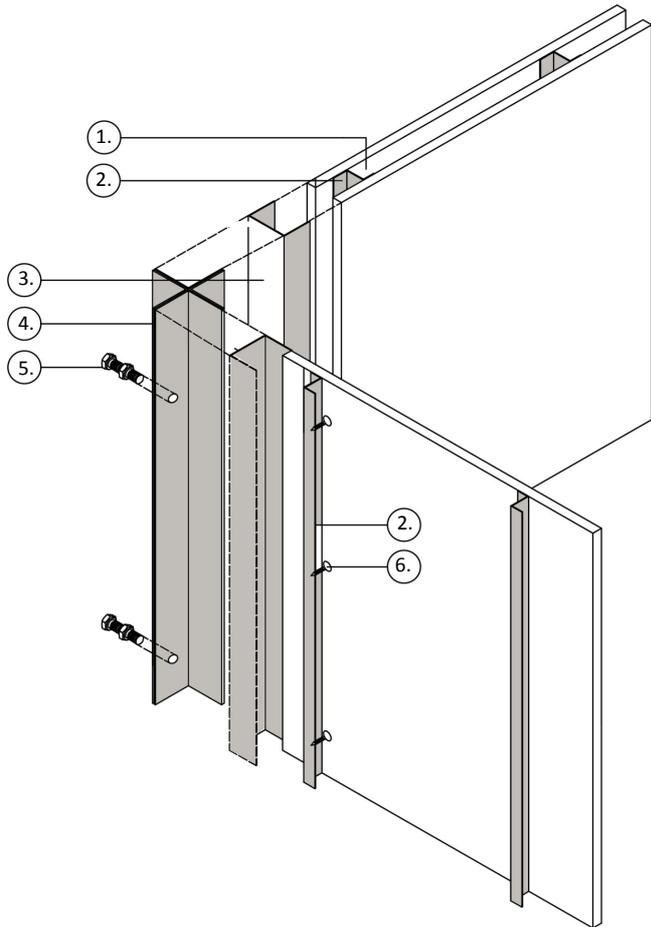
Eucalyptus wall panel fixing
